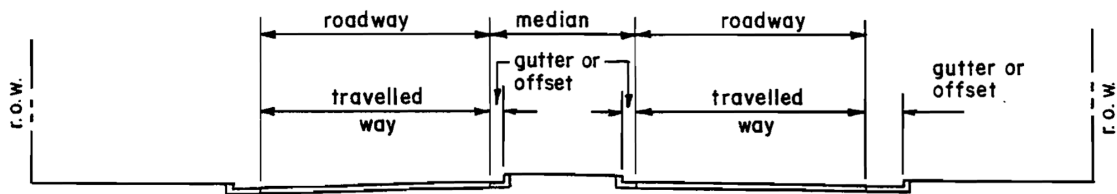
Example cross section design of a typical urban divided road (urban arterial) (part of Figure D1-2 [GDS85])
